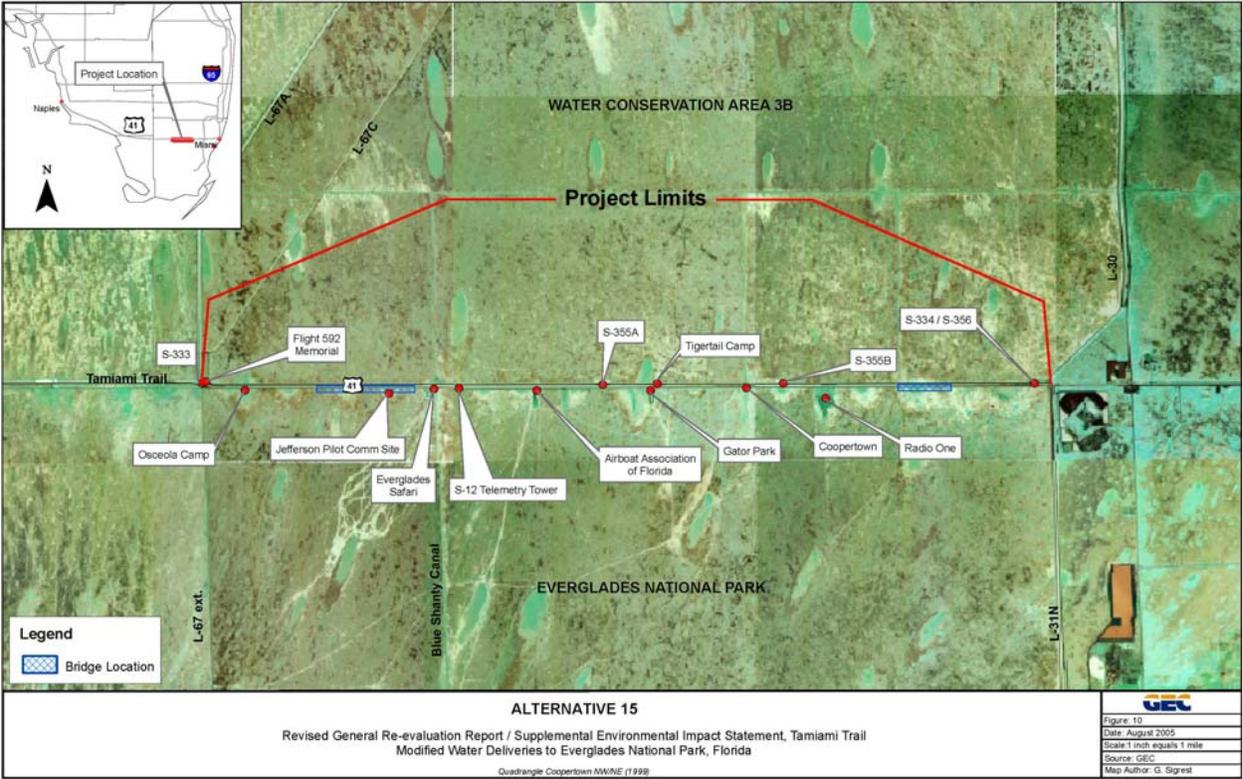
1.3-Mile Bridge West and 0.7-Mile Bridge East Alternative.
